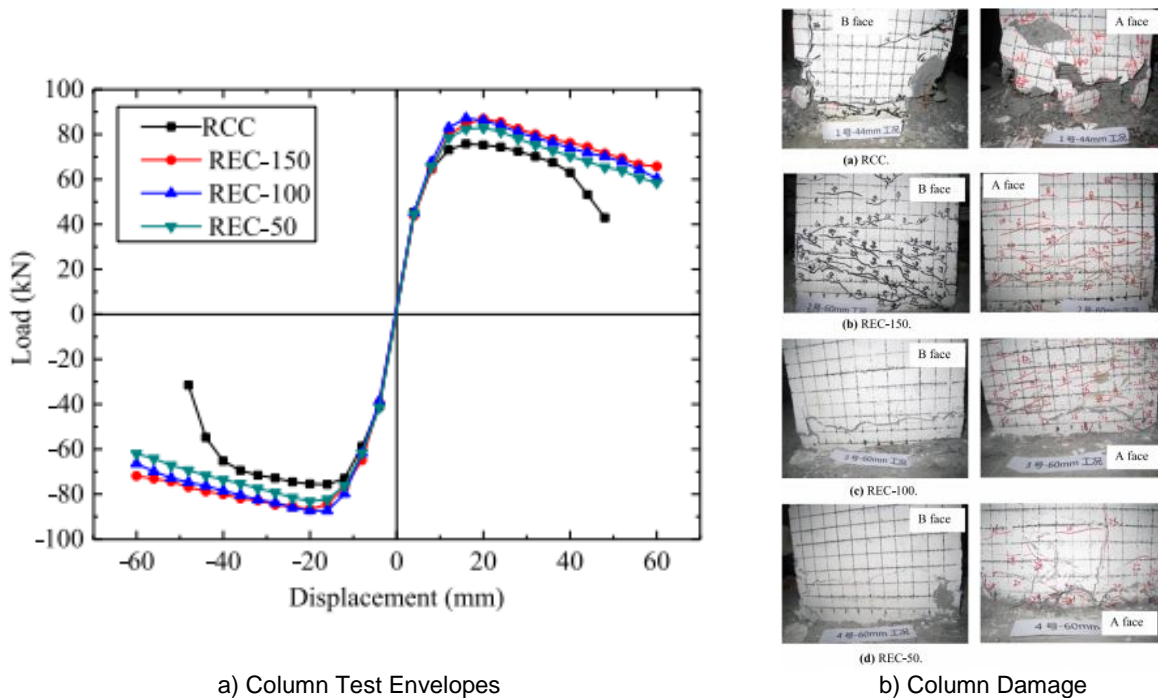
Column Test Envelopes and Damage (Zhang et al., 2019)
